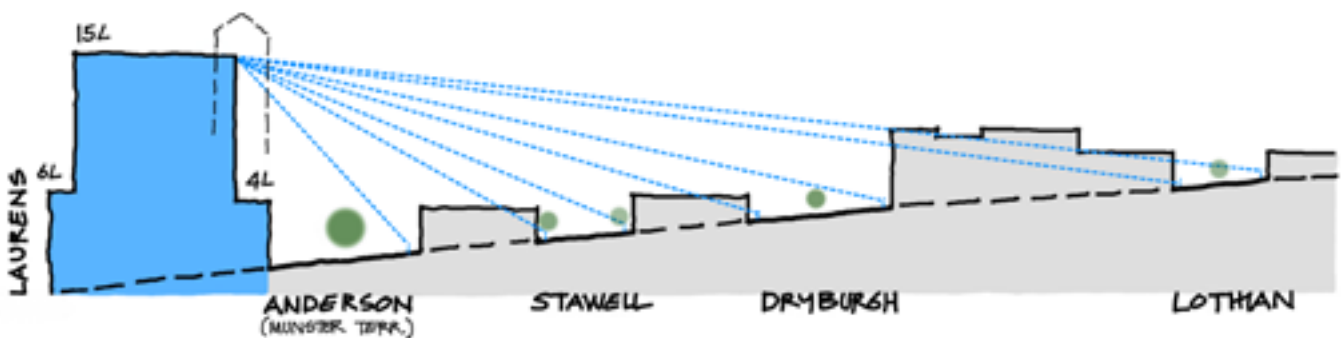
Height transition from North Melbourne to Laurens Street through the Laurens Street sub-precinct.
